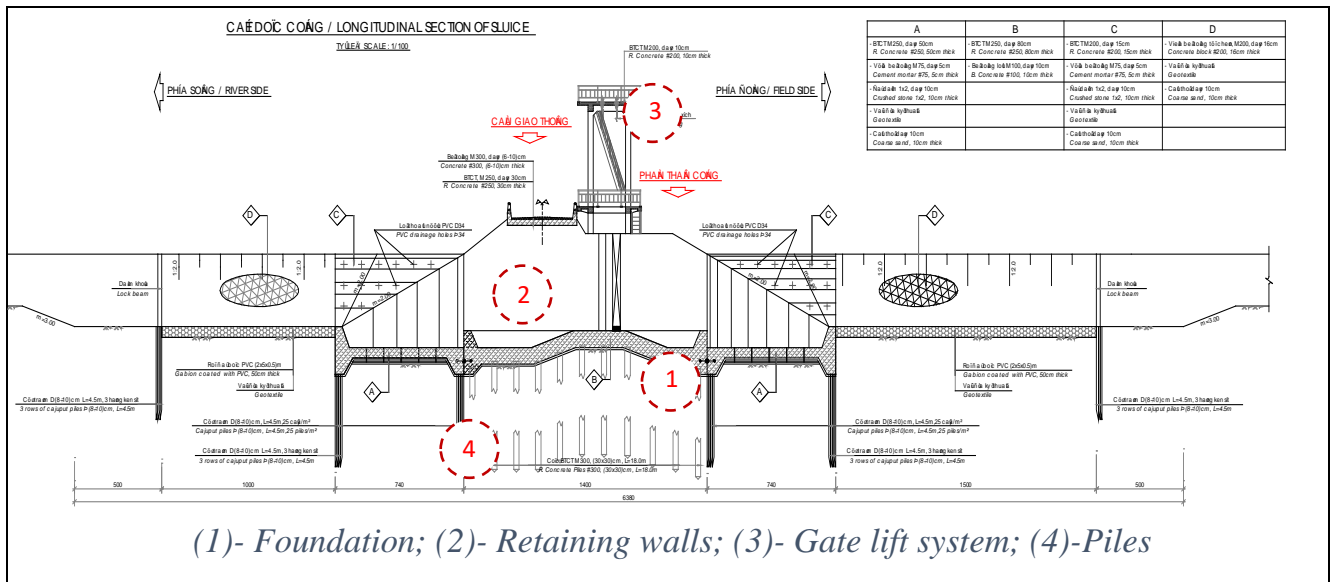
Type 1 - Sluice gate structure of monolithic concrete
